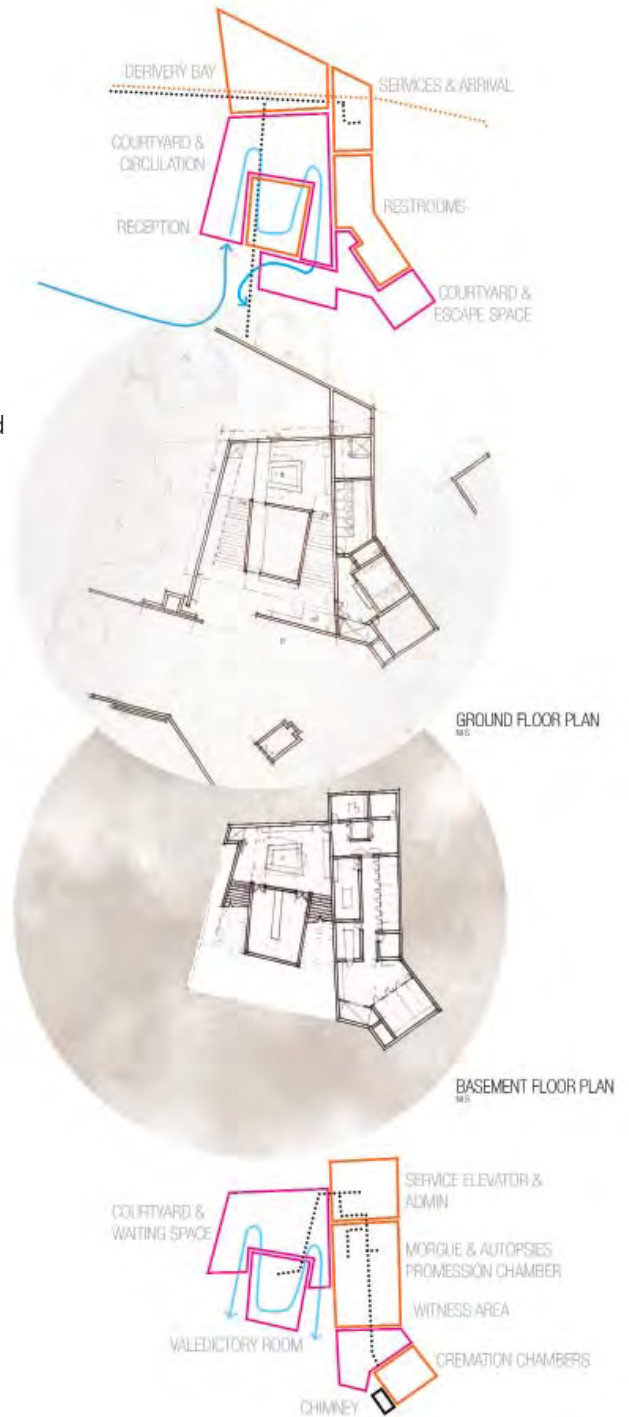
Site Plan Geometry and Crematorium Routes & Relationships (Author)
